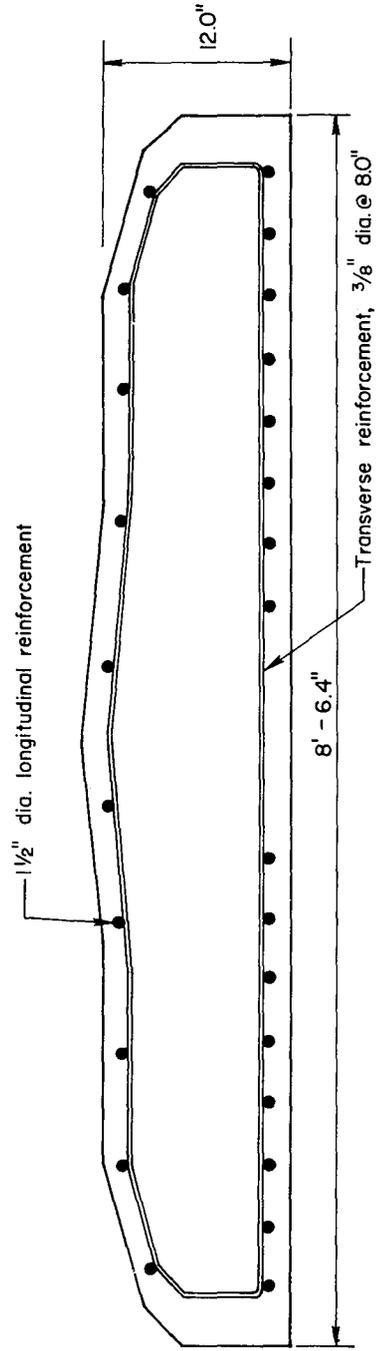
SLAB CROSS SECTION OF LONDON TRANSPORT, NETHERLANDS RAILWAY, AND FRENCH RAILWAYS TRACKS
